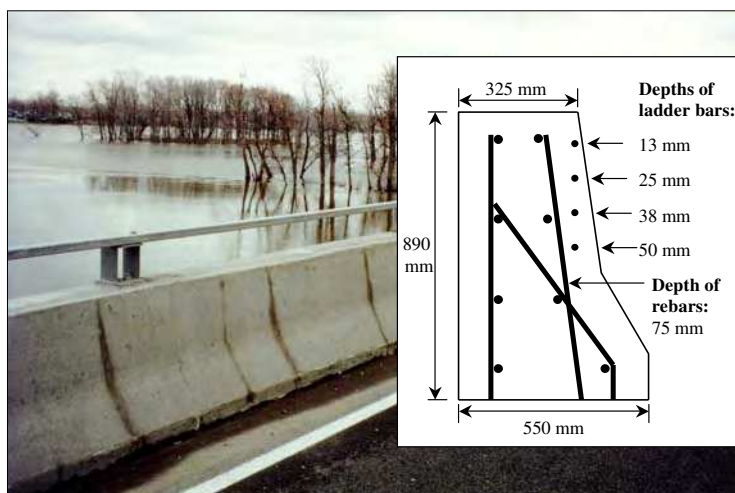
Cross-section of reconstructed barrier wall (Vachon Bridge, Laval, Canada).
